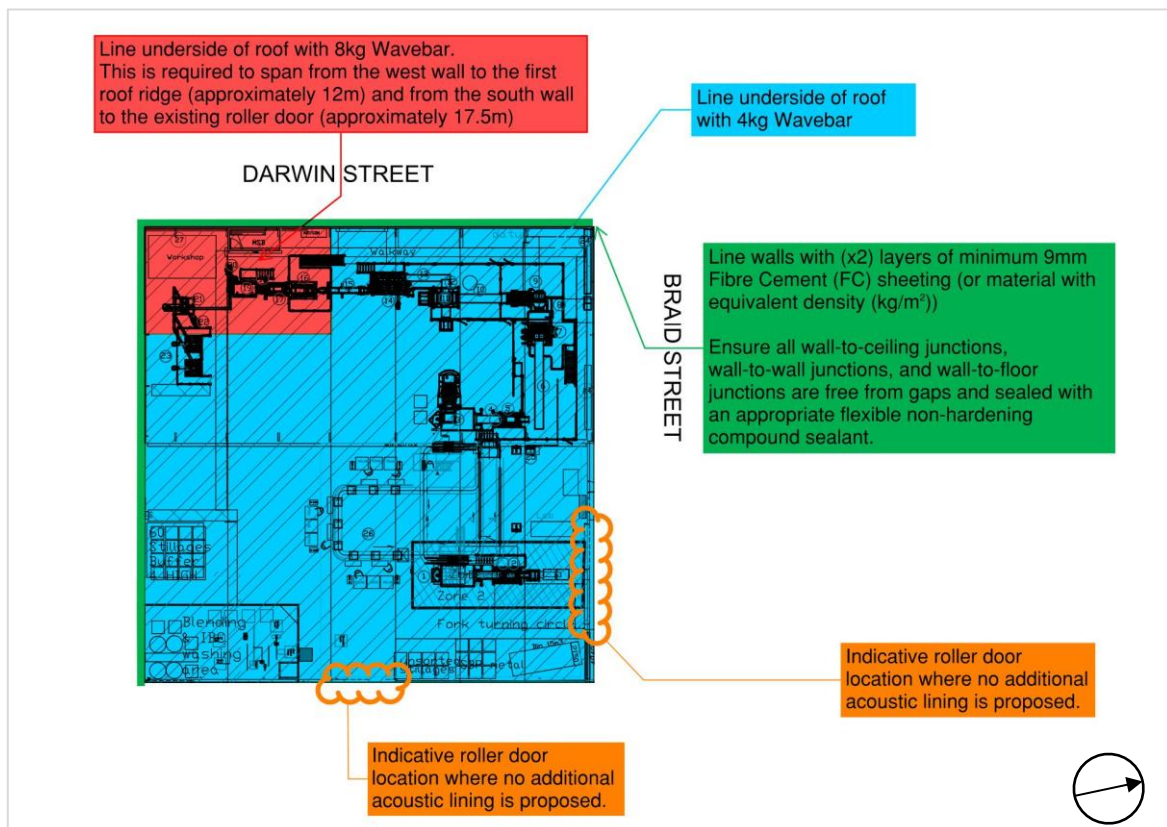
Main Processing Plant Warehouse Layout and sound source locations
